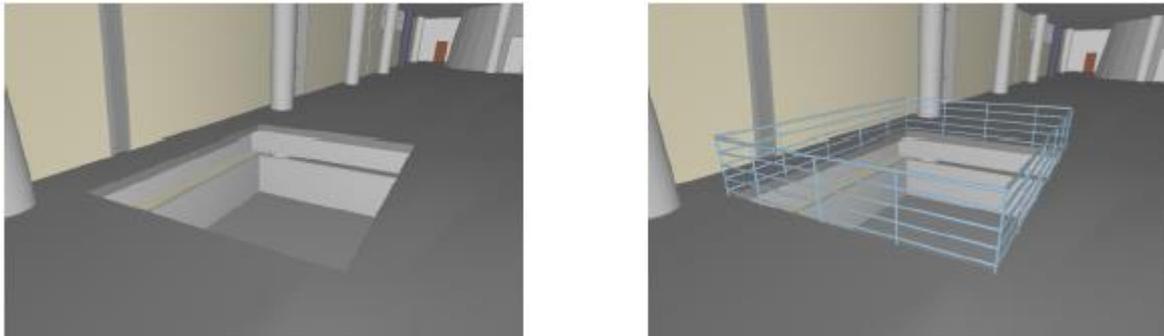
Fall issue: floor opening has no ramp; railing is added.
